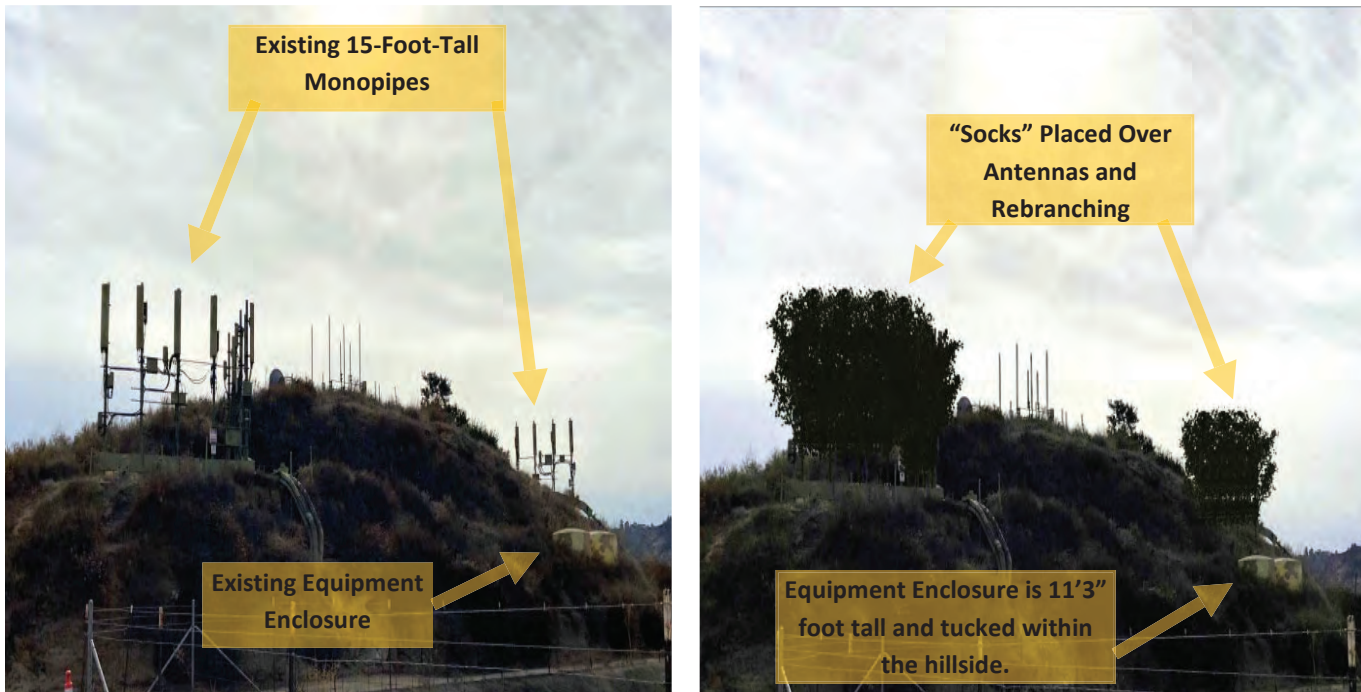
View on site of existing (left) and proposed (right) mono-broadleaf tree and equipment enclosure, looking northwest.
